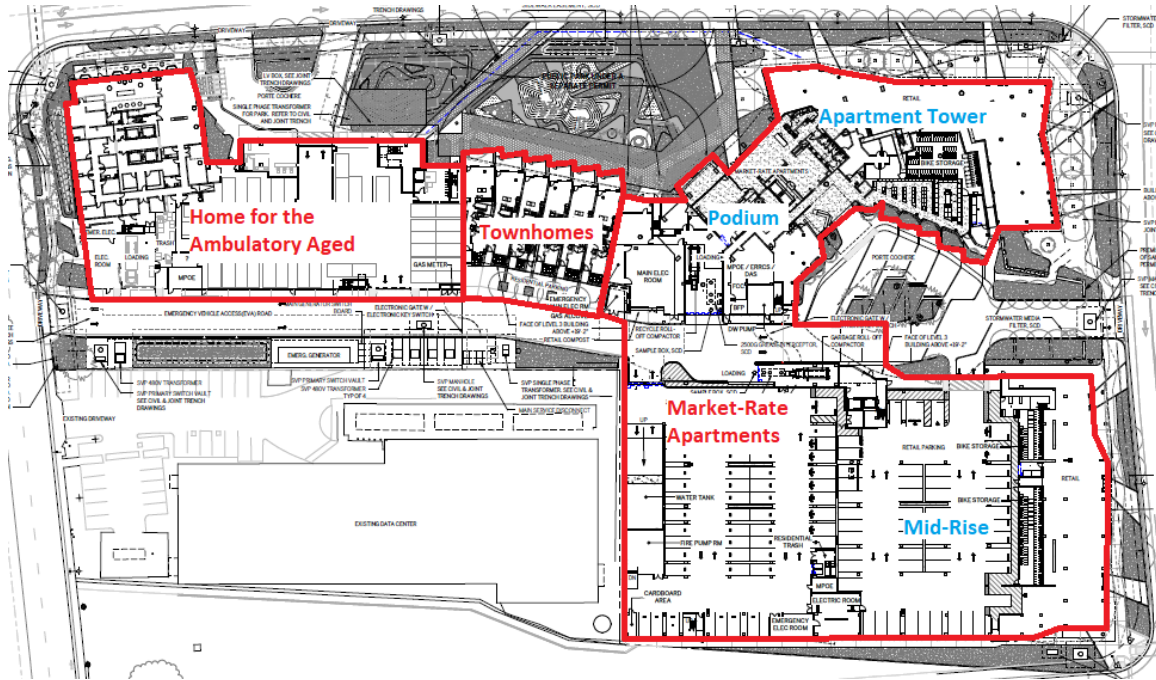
Project site plan outlining the two primary buildings in red and identifying components of the market-rate apartment building in blue.
